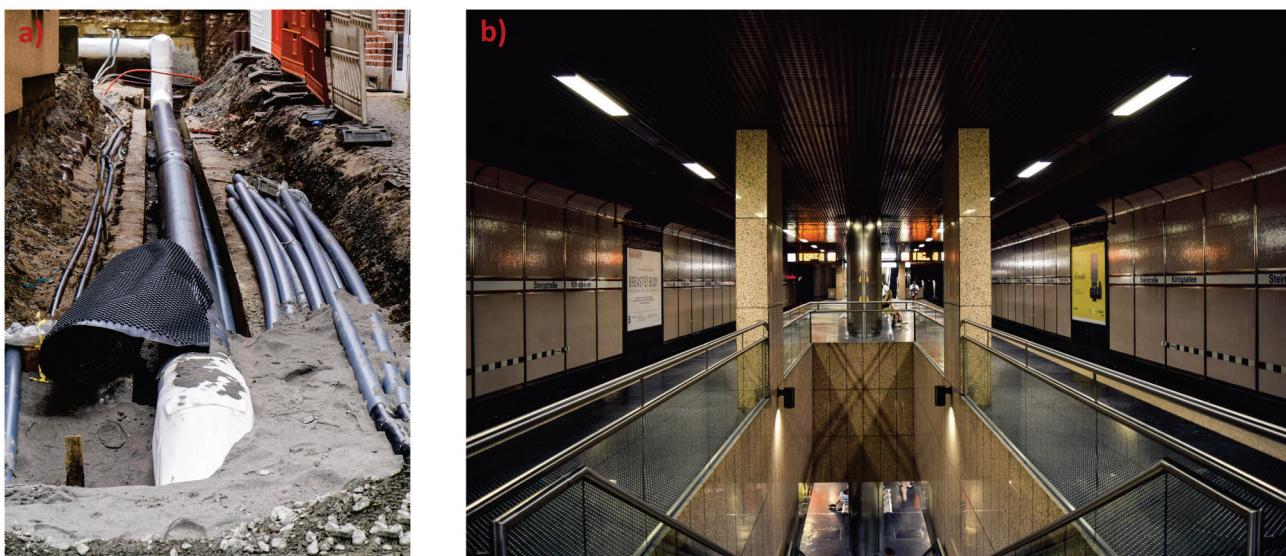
Examples of the underground facilities that legal spaces need to be defined in 3D are (a) underground pipelines, b) storeys of a subway).
